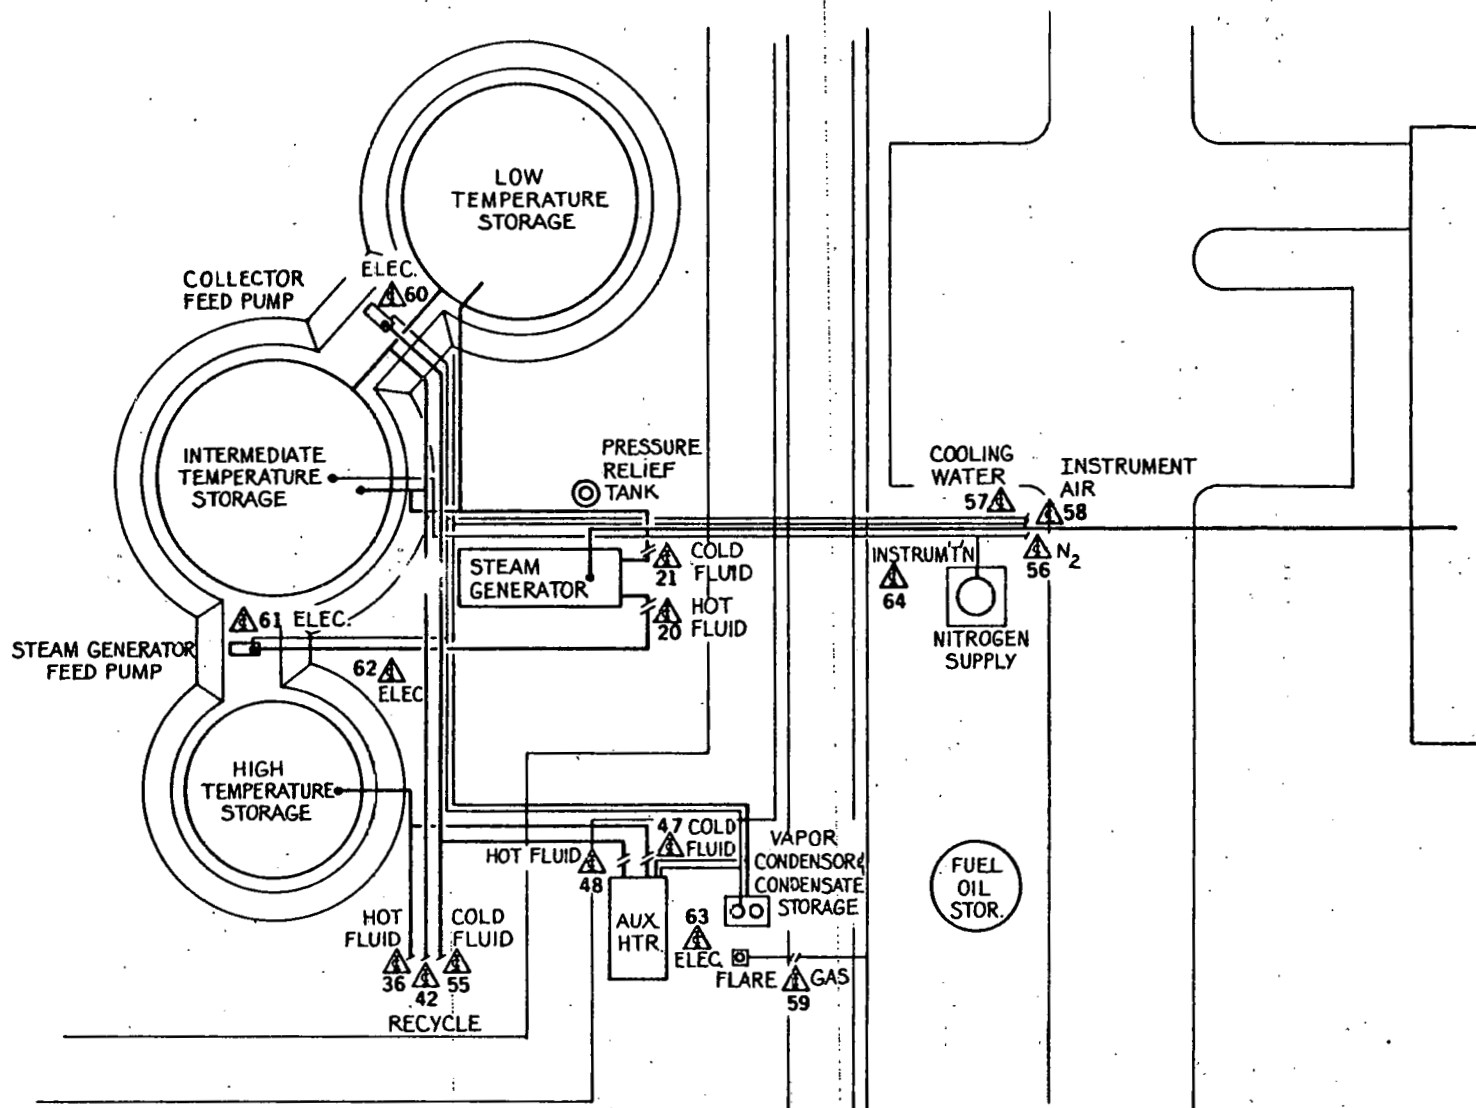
Thermal Storage Subsystem Site Interface Drawing
